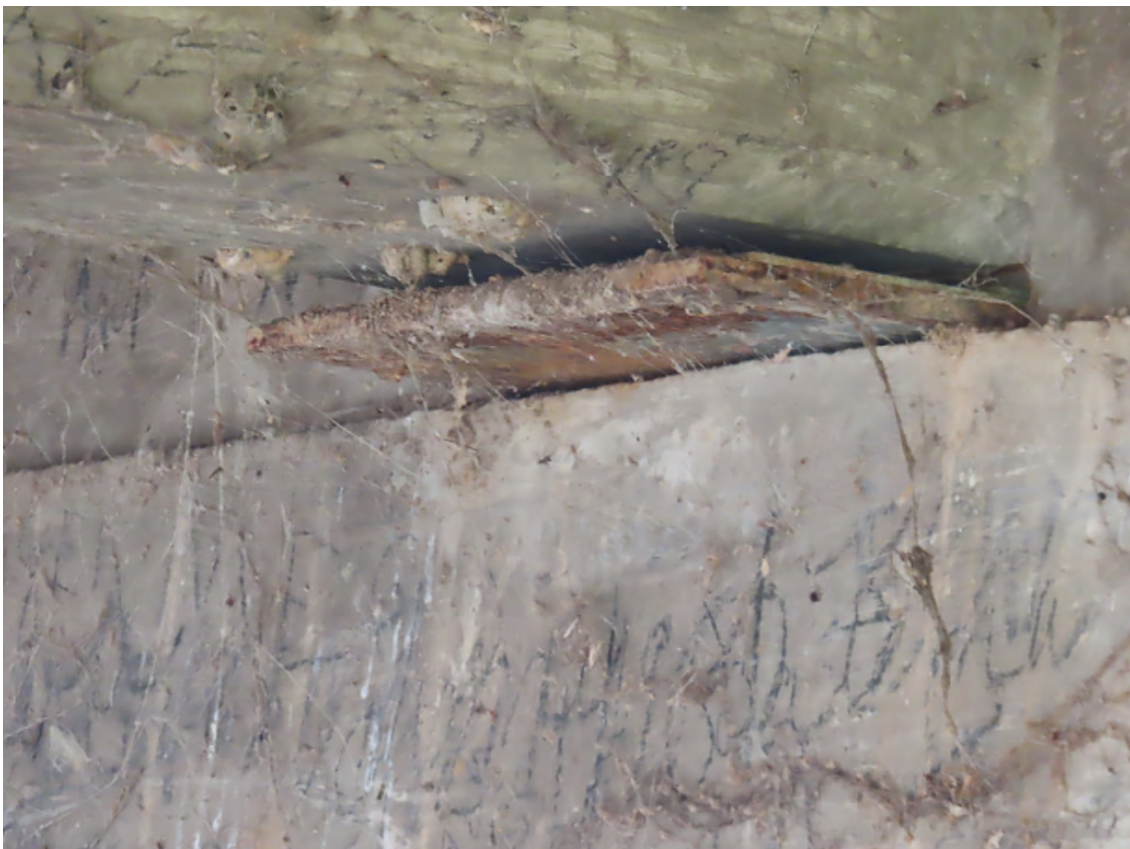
Tumbarumba (west) abutment. Centre beam bearing dislodged.
